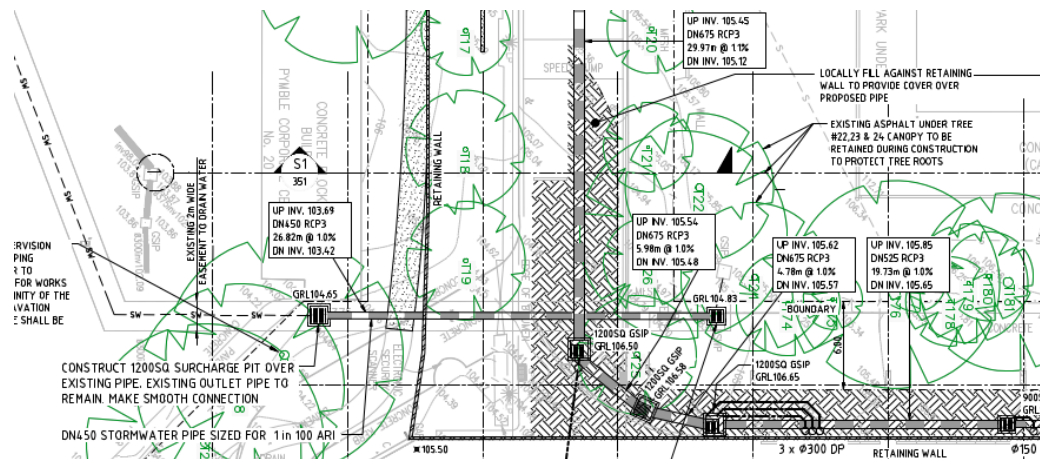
Proposed 450 diameter stormwater pipe (Stamped Approval Civil Plans – C&M Rev 11 23/11/18)
